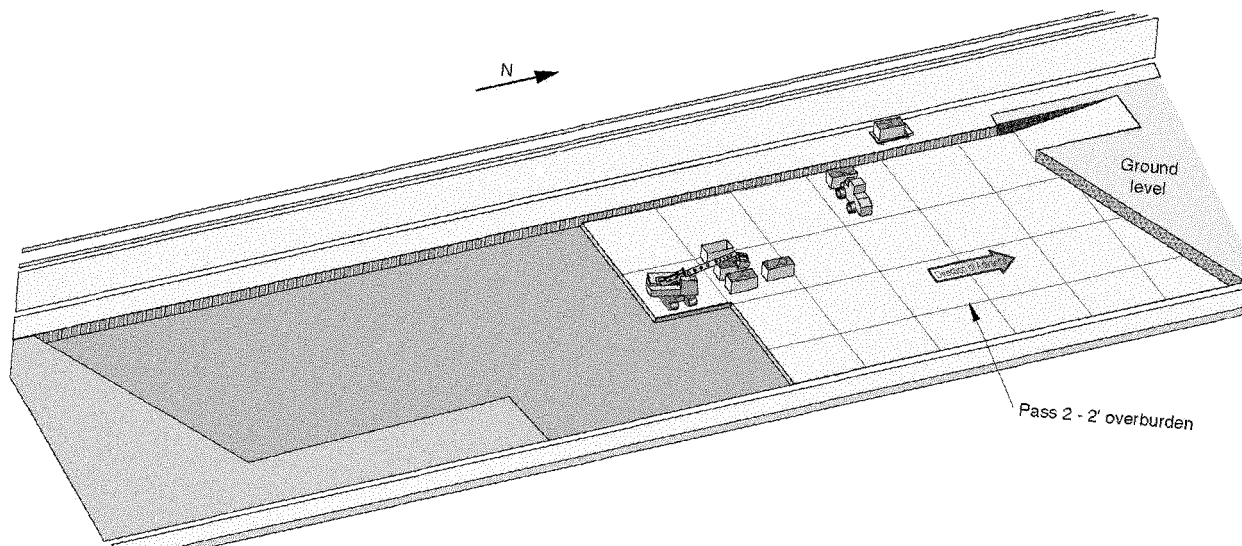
The backhoe and forklift/loader excavate the next 2 ft of overburden moving south-to-north.
